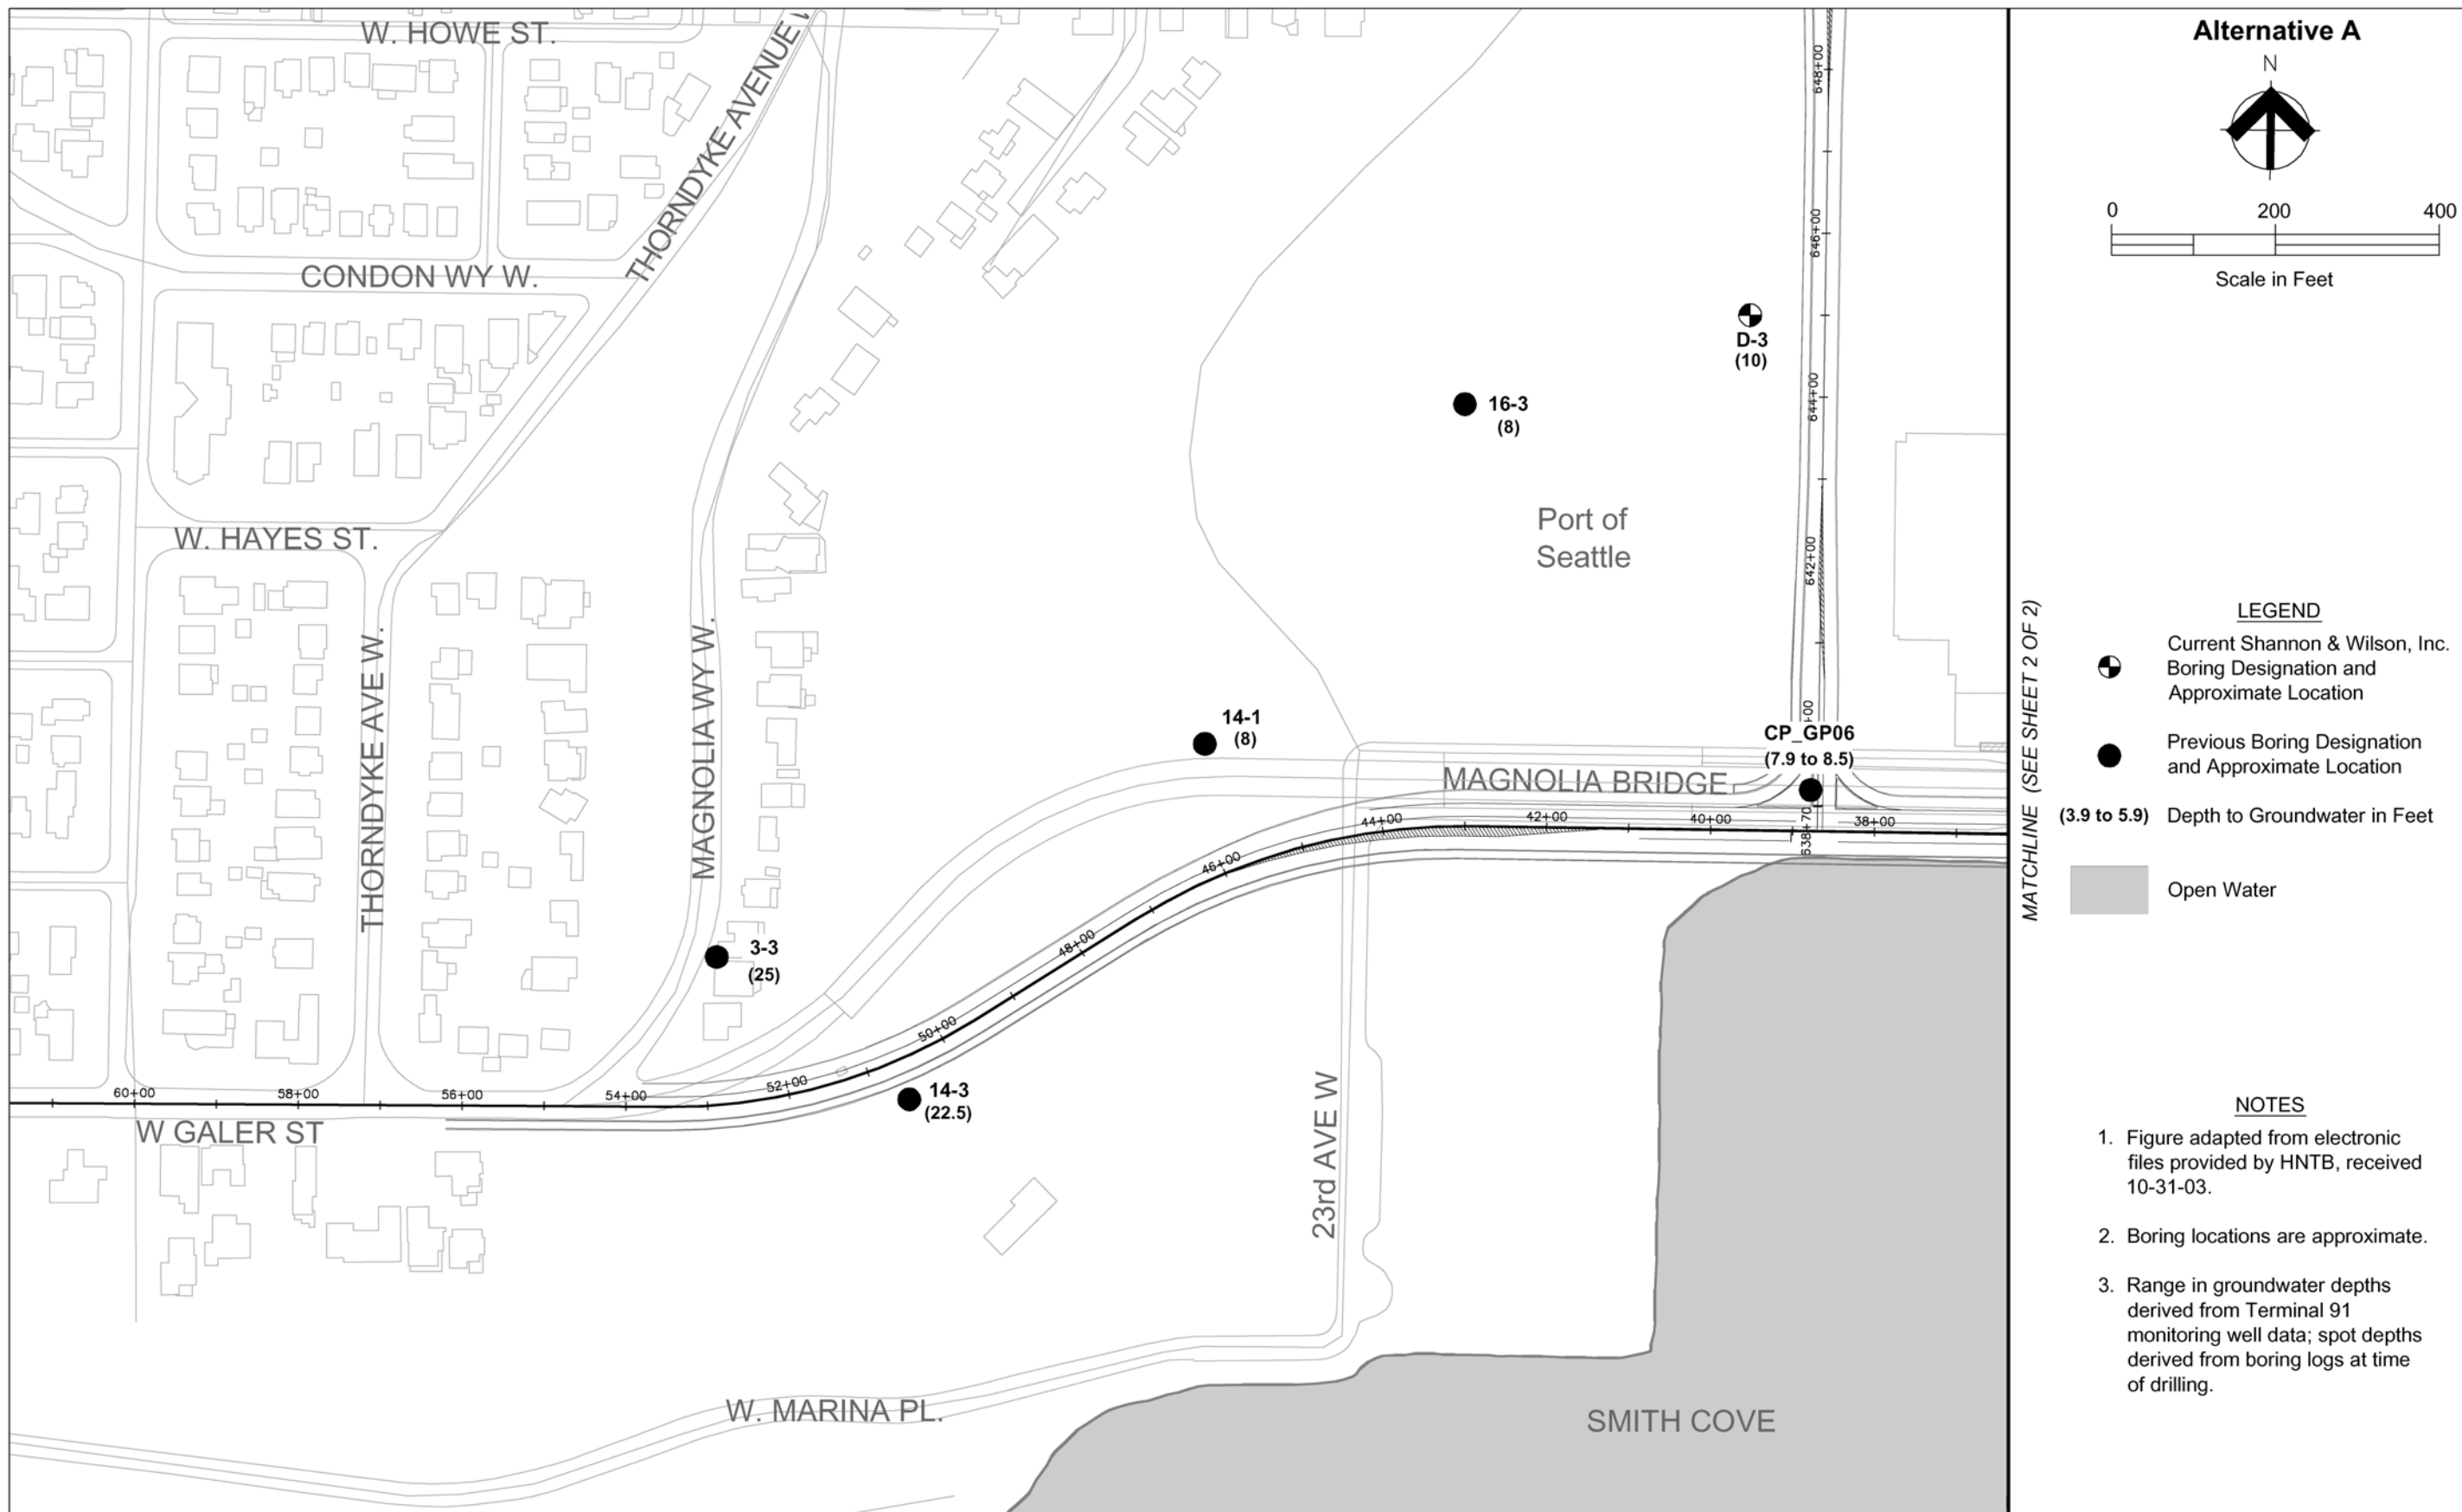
, Sheet 1 of 2 - Depth to Shallow Groundwater - Alternative A
